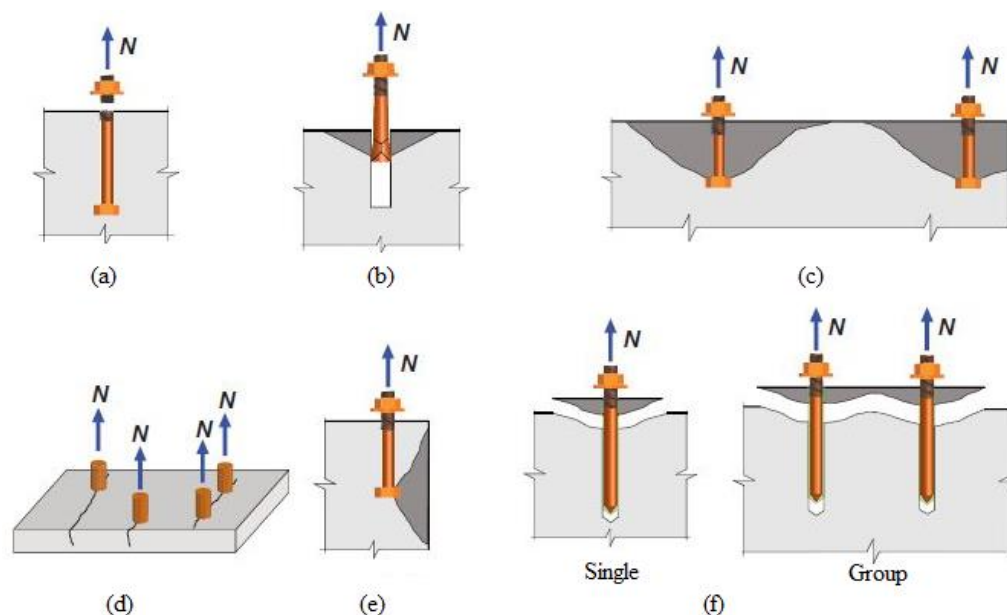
Anchor failure mechanisms, a-steel failure, b- pullout, c- concrete breakout, d- concrete splitting, e-side-face blowout, f-bond failure (ACI 318-19).
